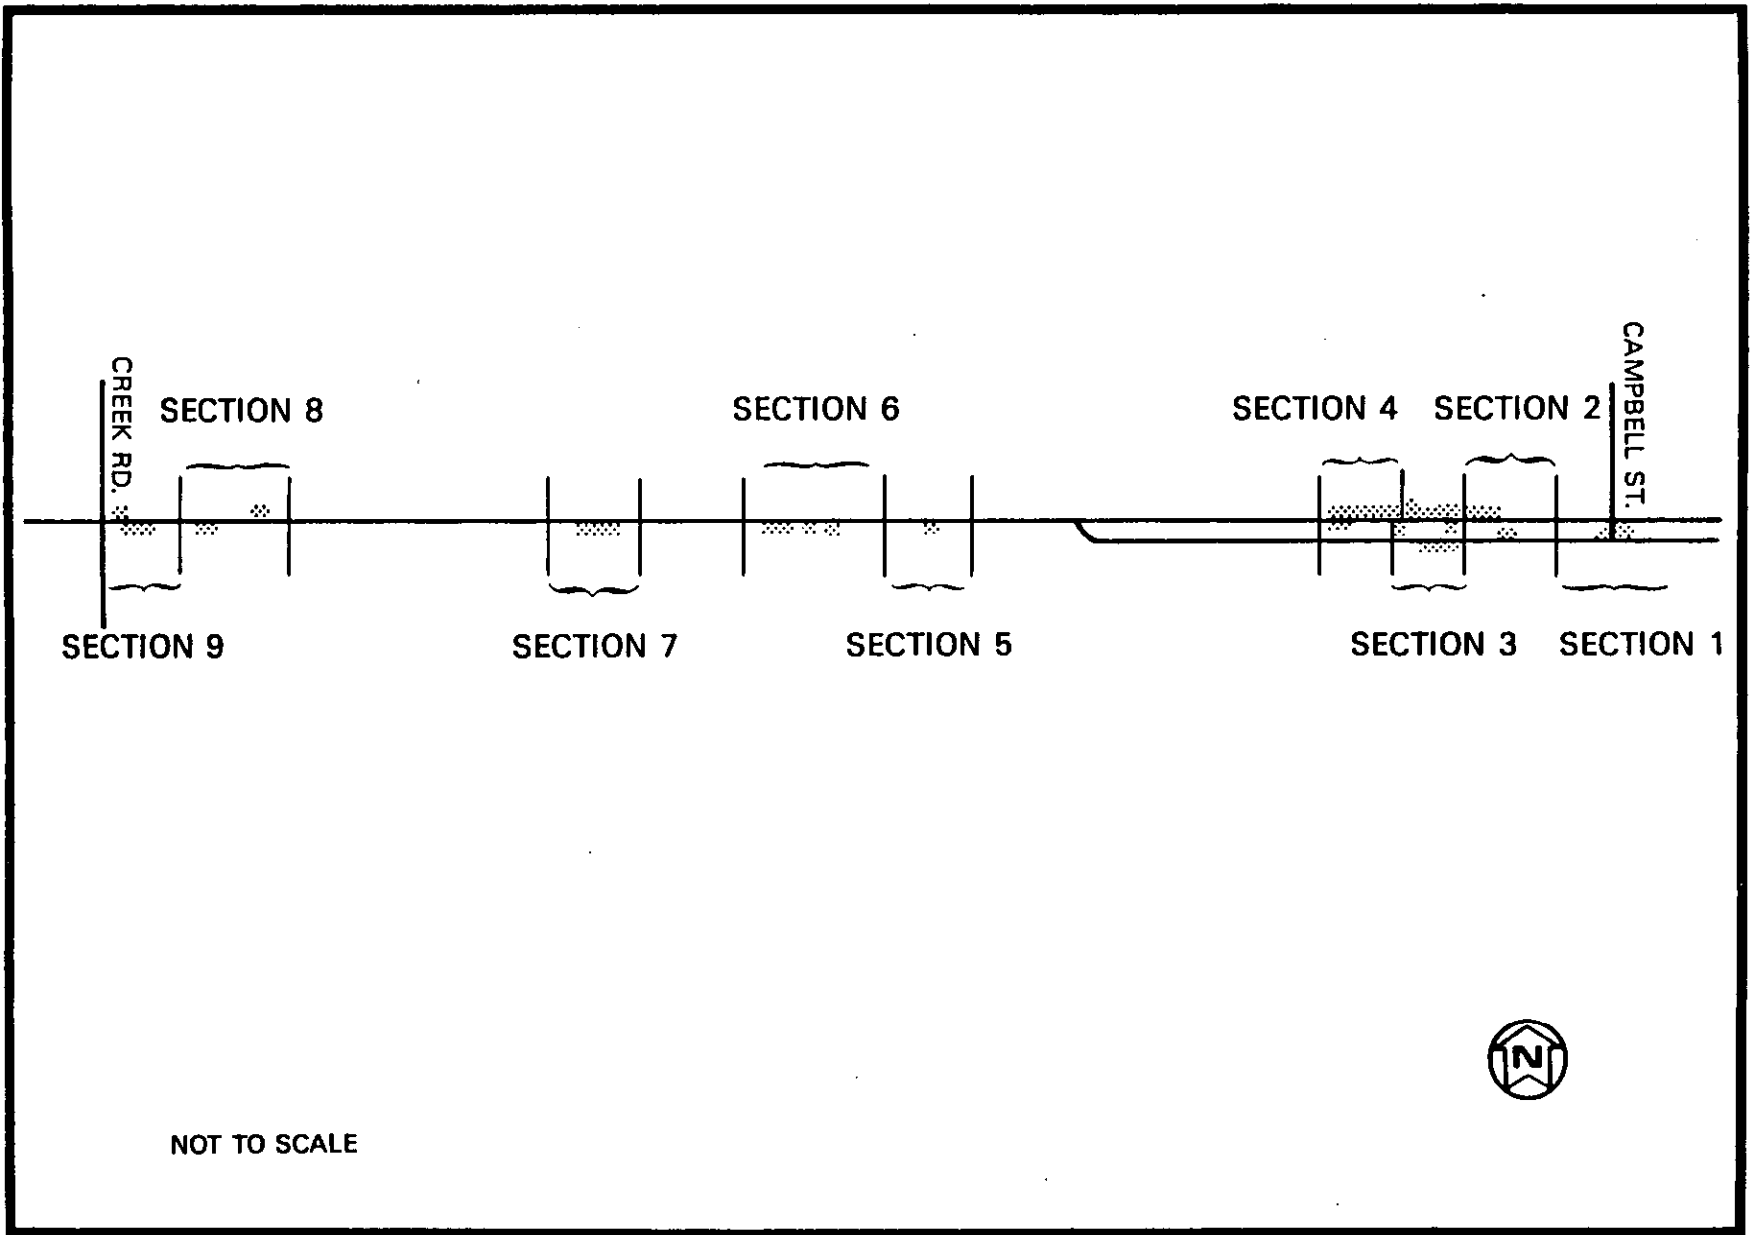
EXCAVATED AREAS ON PLETCHER ROAD
